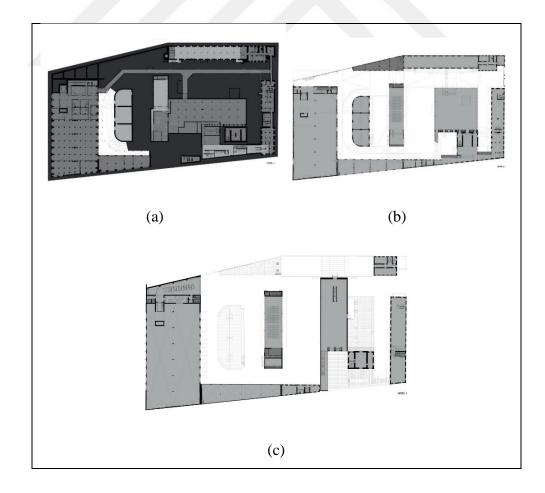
Plans of Fondazione, (a) Level -1; (b) Level 0; (c) Level 1 [72]
